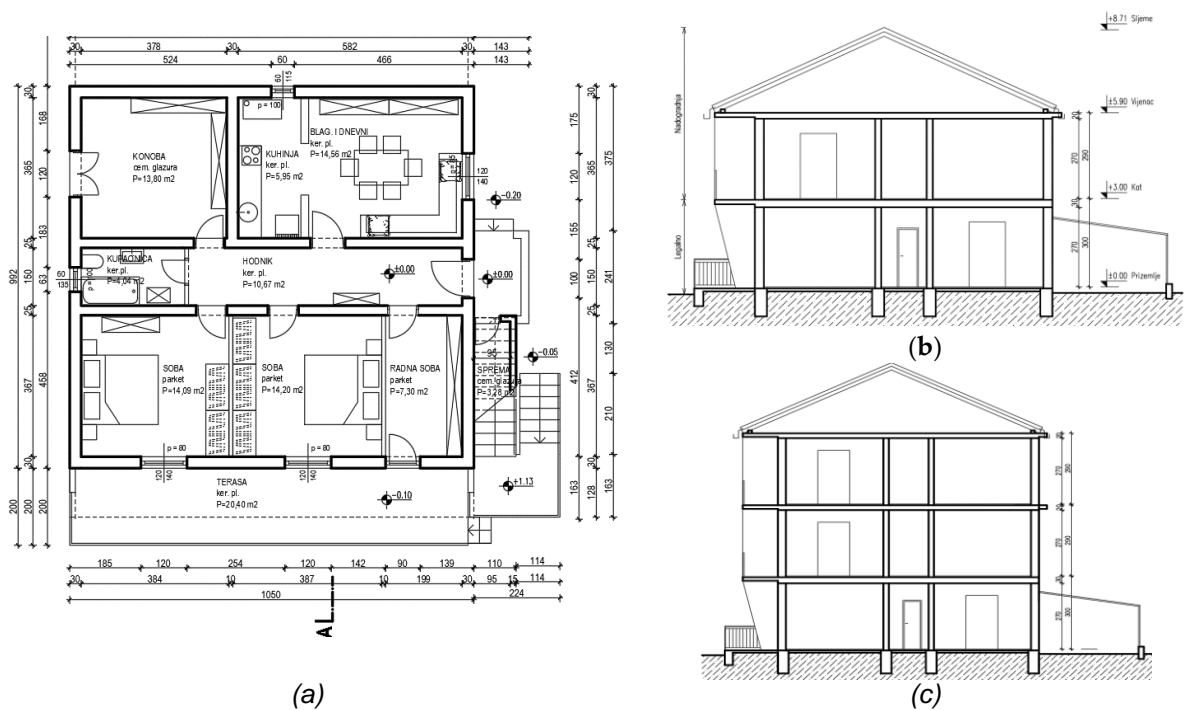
Typical configurations outside of the historical centre: (a) plan; (b) section view P + 1; (c) section view P + 2.
